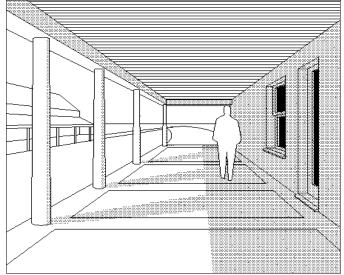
Colonnades and overhangs shade building exterior and reduce cooling loads.
